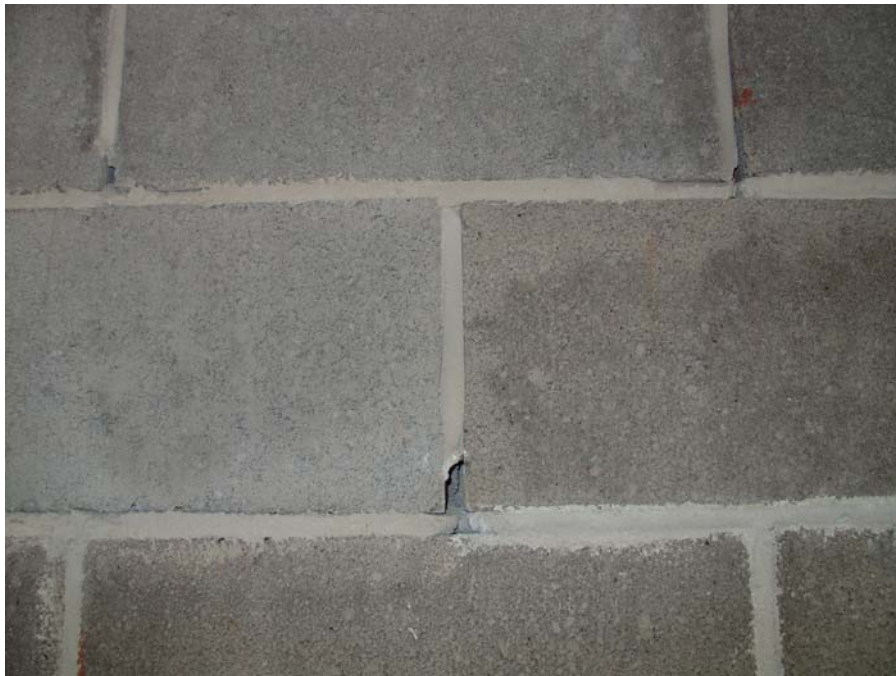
Perpends not fully filled in internal blockwork leaf of external wall.
